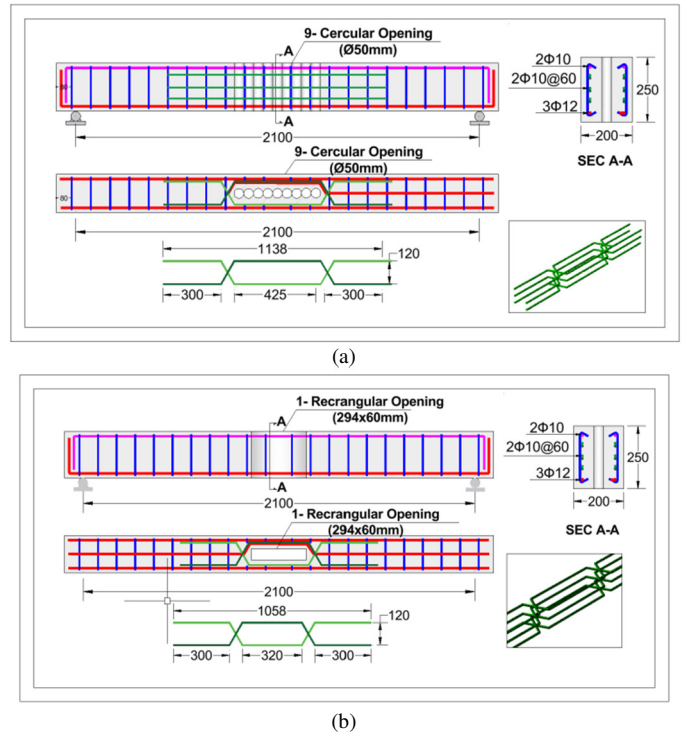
Details of beams with strengthened openings: (a) B1-C-C9-SR, a beam with circular opening reinforced with rebar; (b) B2-C-S1-SR, a beam with rectangular opening reinforced with rebars.
